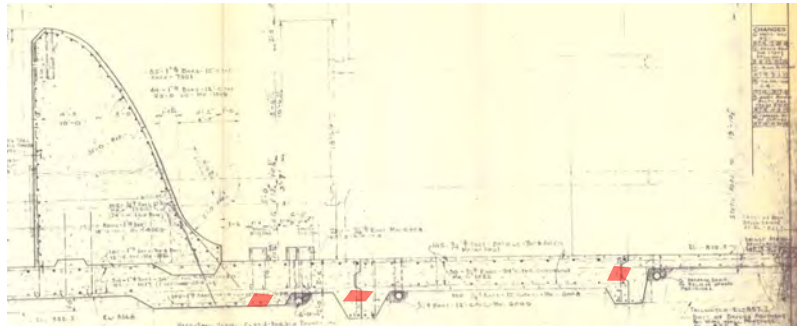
Downstream Spillway Slab, 3 seepage drains - Section Looking Left
